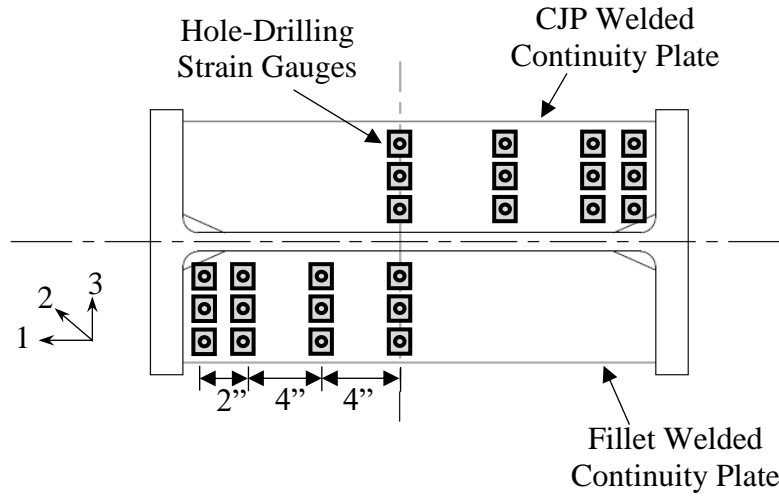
Specimen W1: Hole-Drilling Strain Gauge Layout
